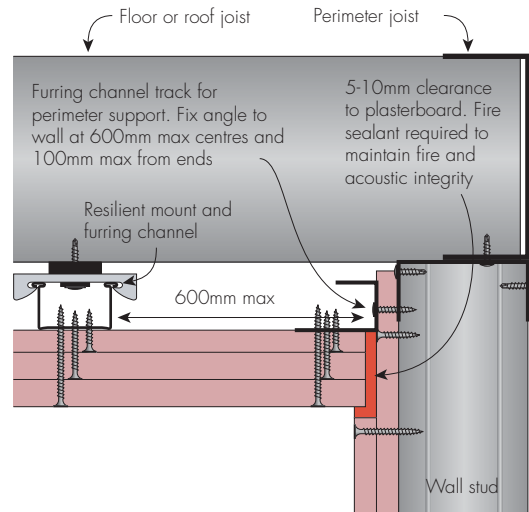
Fire Rated Ceiling to Wall – Alternate Detail
